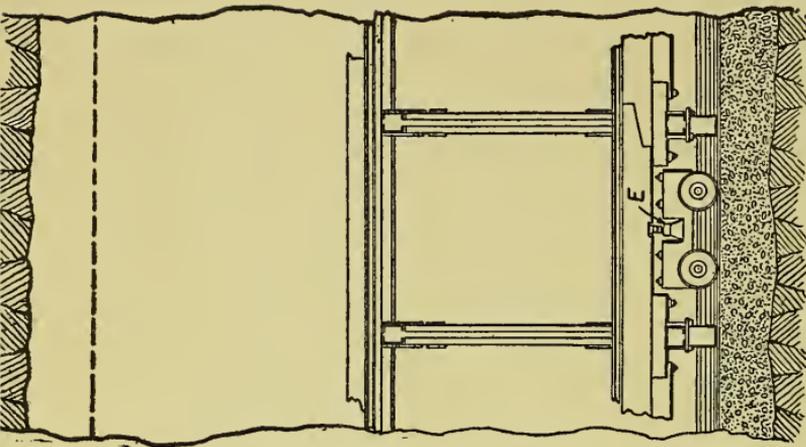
SECTIONAL SIDE VIEW OF THE FORM.
